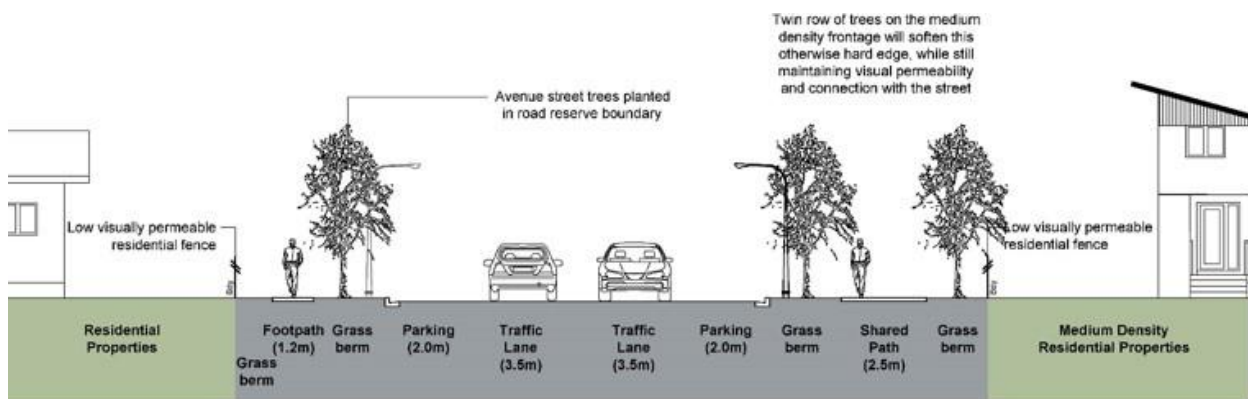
F: Cross section of Collector and Secondary Collector Roads in the General Residential Zone
